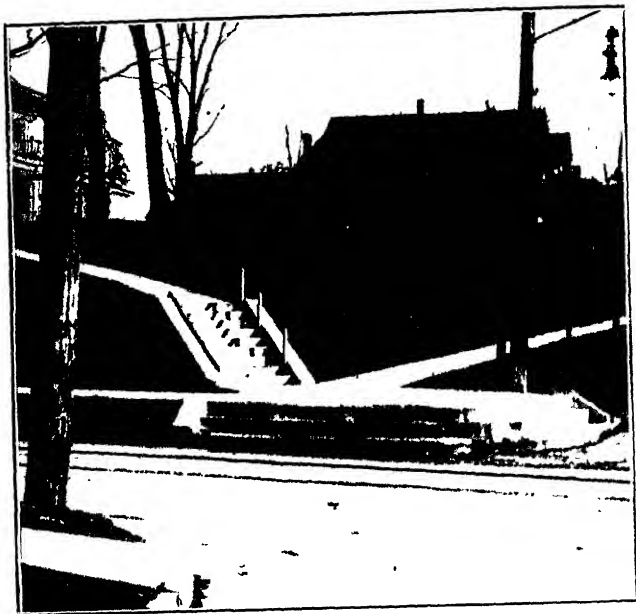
STEPS FROM ELEVATED SIDEWALK,
